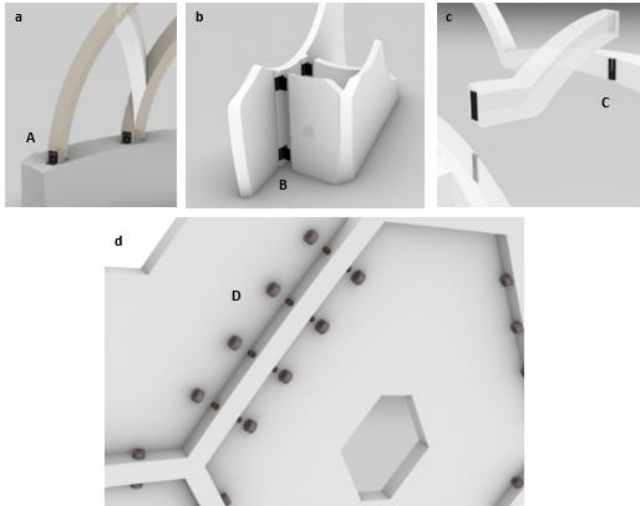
Building System: Illustration of the Bioluminescent Pavilion.
